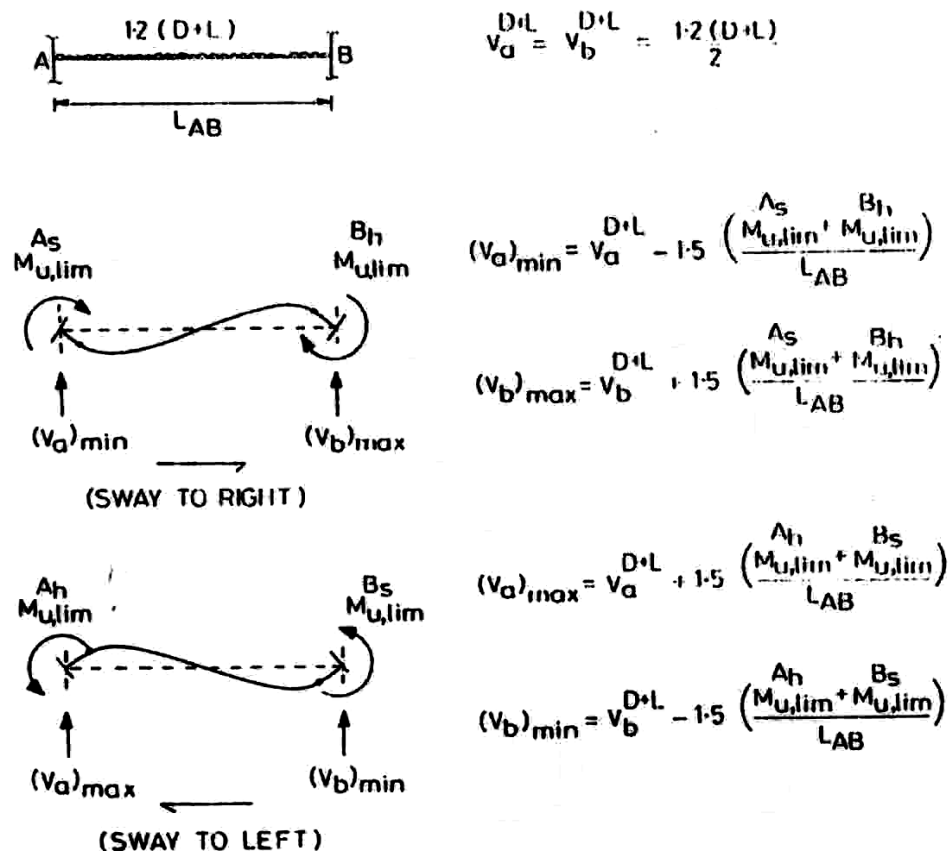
CALCULATION OF DESIGN SHEAR FORCE FOR BEAM
